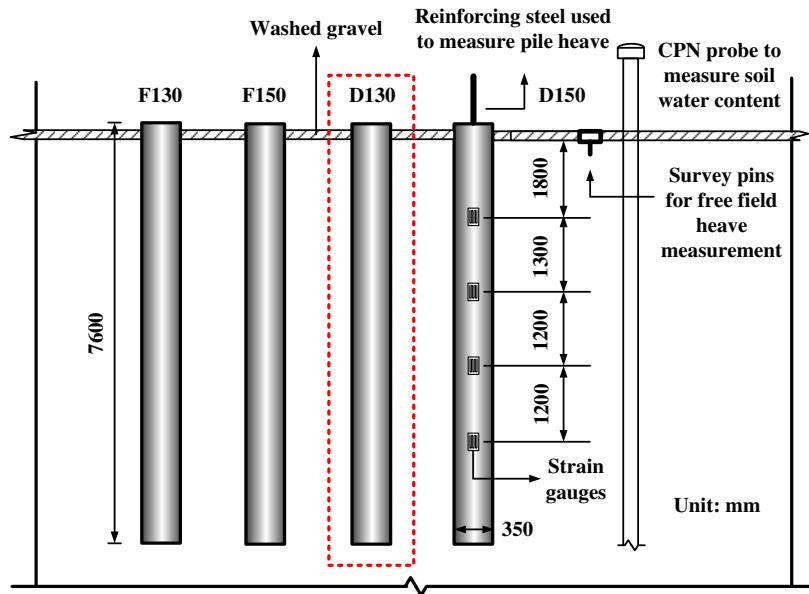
Diagram of the drilled reinforced concrete pile at CSU expansive soil test site (modified after Benvenga 2005).
